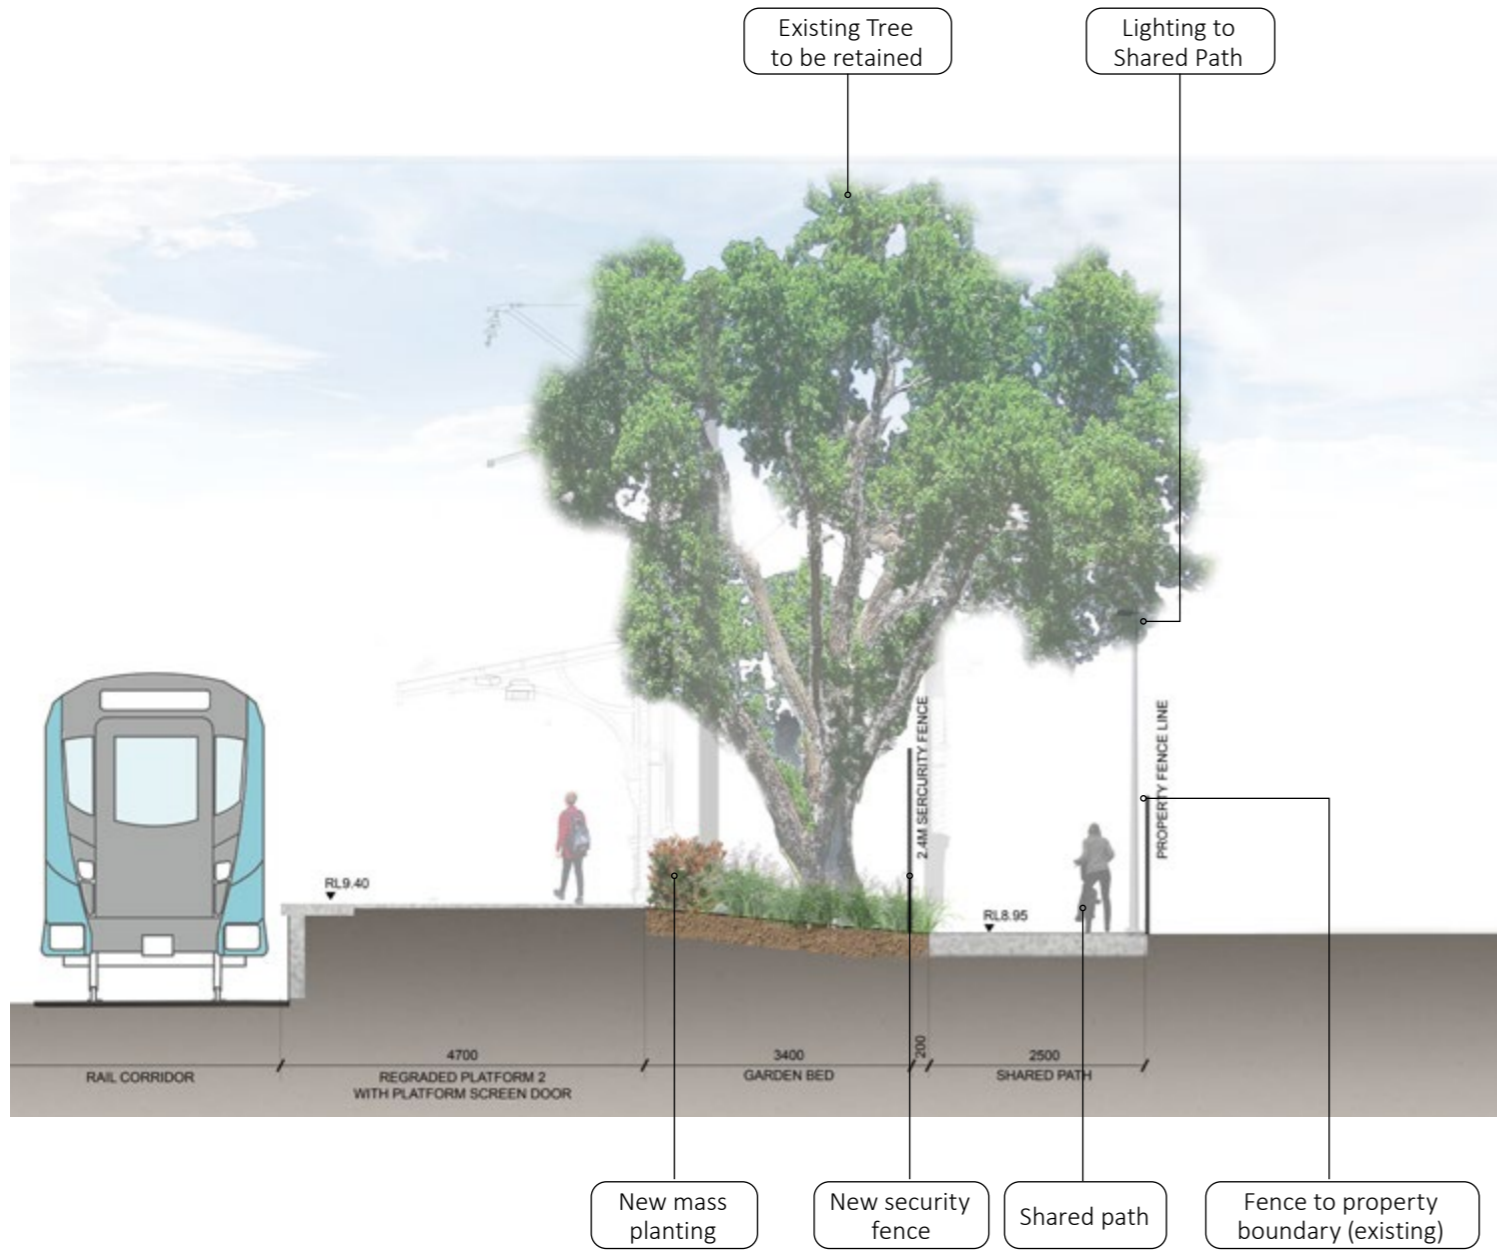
Section A Marrickville - Detailed section of the shared path
